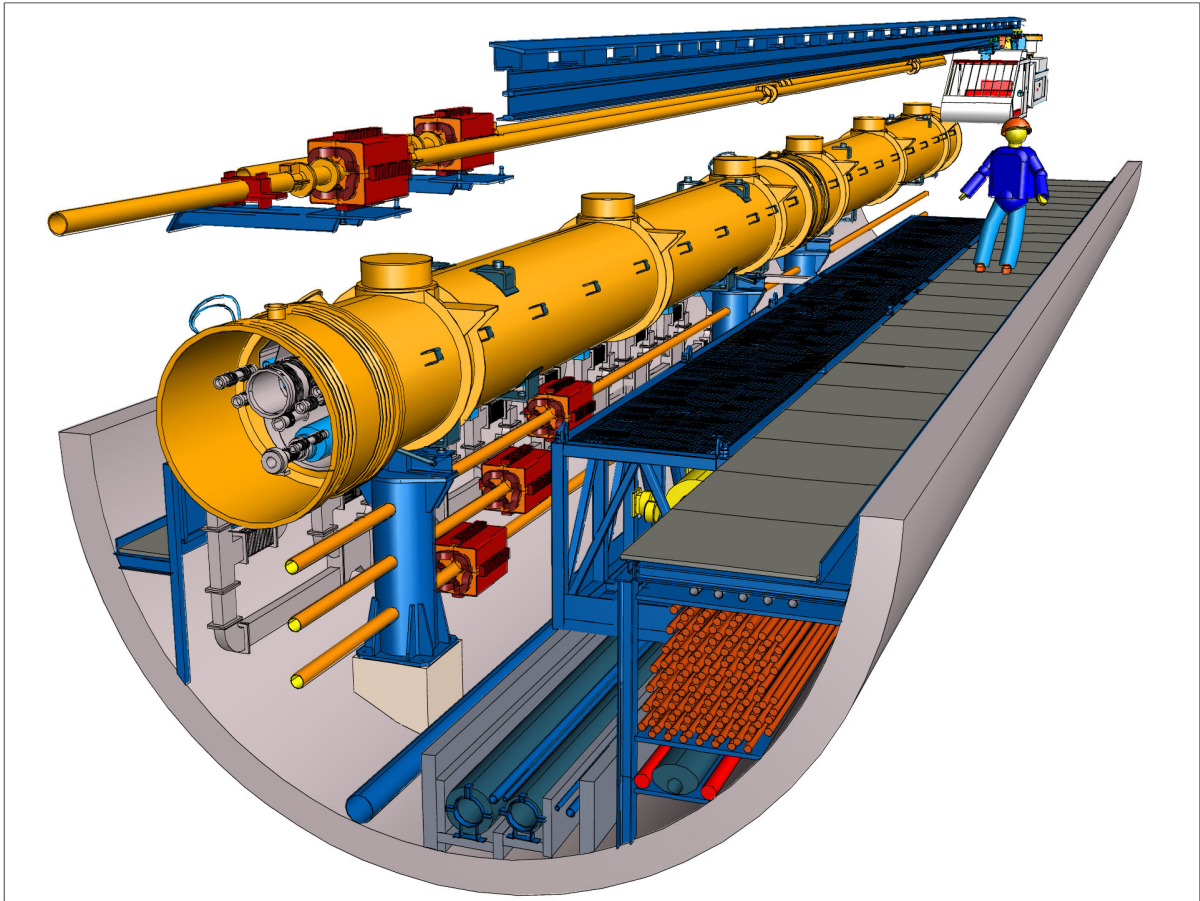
Artist view of one possible tunnel layout for a superconducting linear accelerator.
